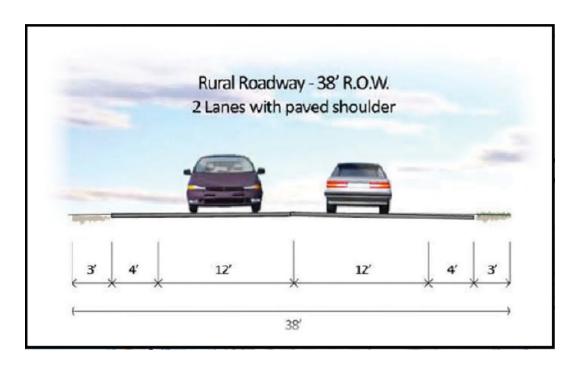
Roadway Cross Section Considered to Date - Colusa County Rural Roadway
